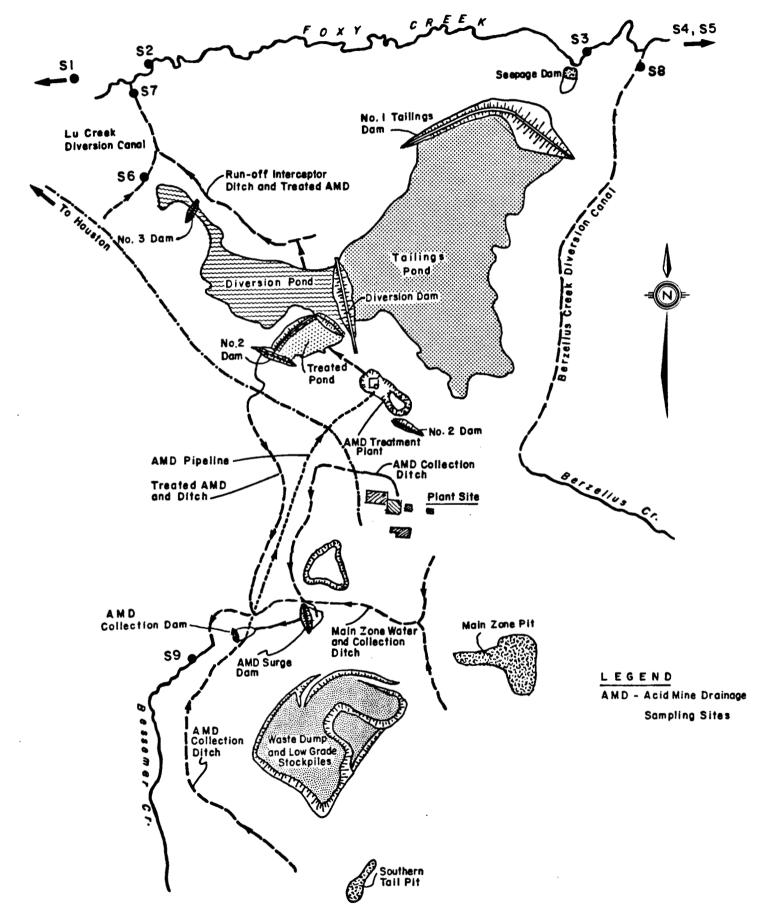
EQUITY SILVER MINES LTD. - SITE PLAN
